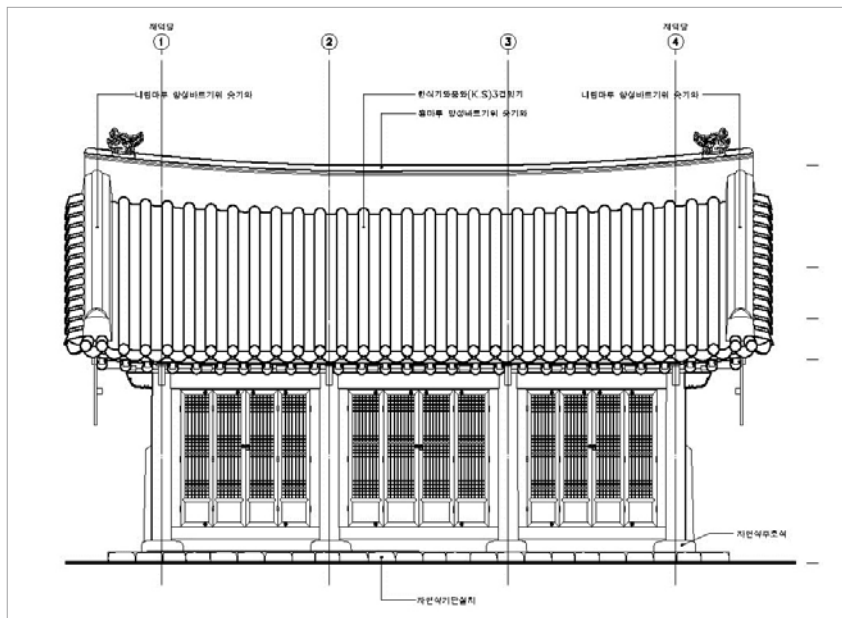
Drawing for Hall named Jaedeok Reconstruction
